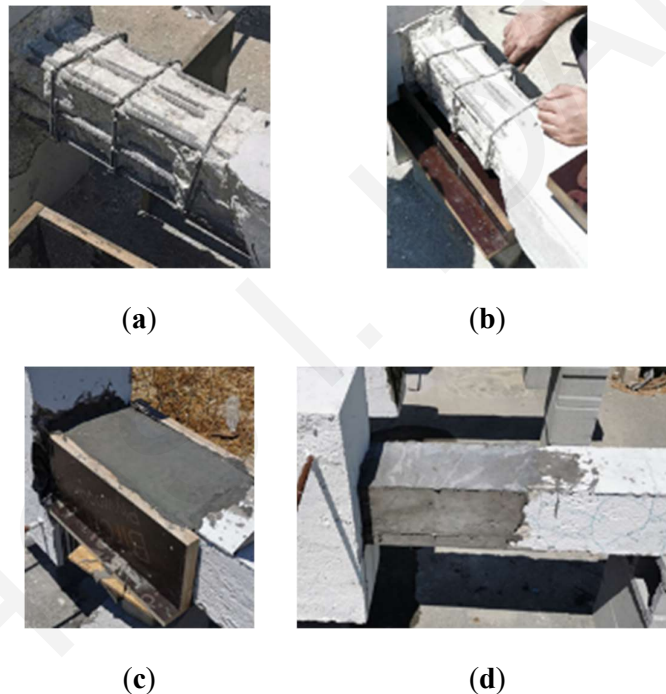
7: (a) Removal of damaged cover to full revelation of the bars; (b) Bottom extendable form for lower cover cast; (c) Side forms for side and top cover cast; (d) Final result of cover replacement.
